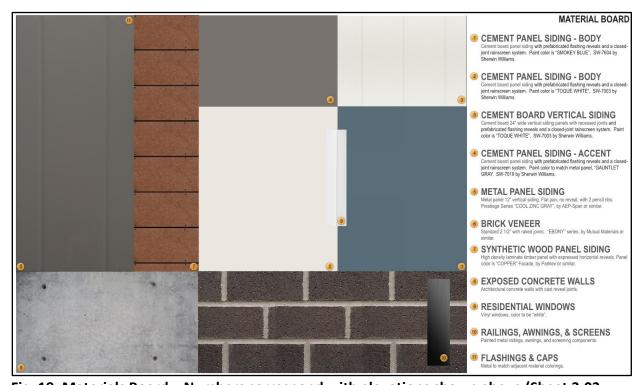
Materials Board – Numbers correspond with elevations shown above (Sheet 3.03)
